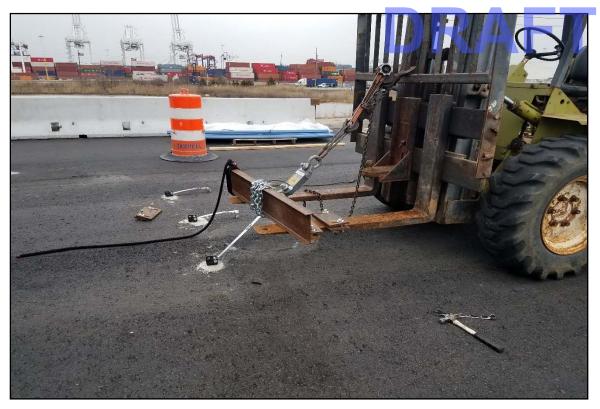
View of SP22 frame clamp and strapping assembly attached to the SP12 anchor.
